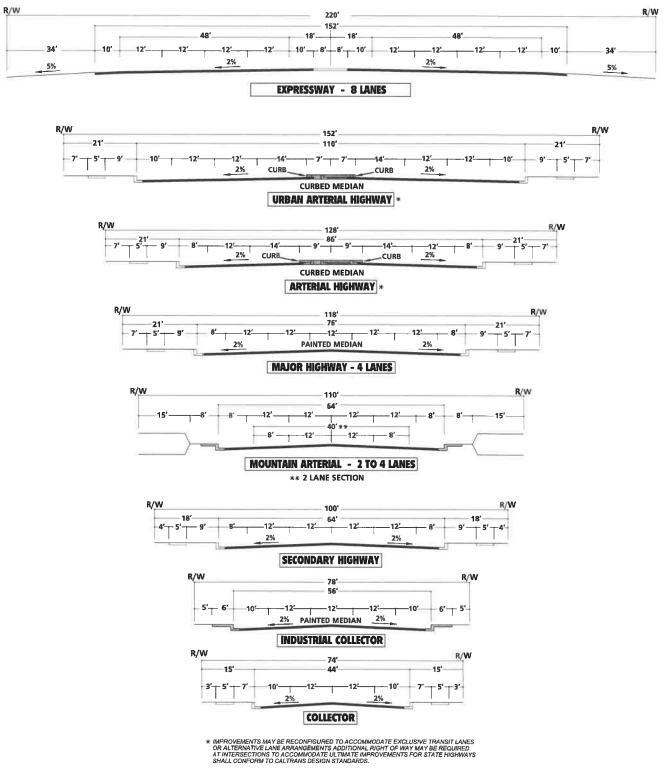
CITY OF WILDOMAR GENERAL PLAN ROADWAY CROSS-SECTIONS
